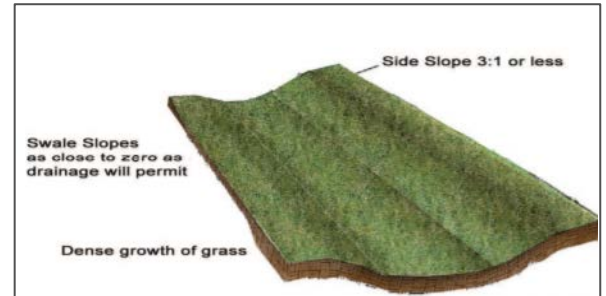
Typical Configuration of an Enhanced Grass Swale (Source: CVC).
